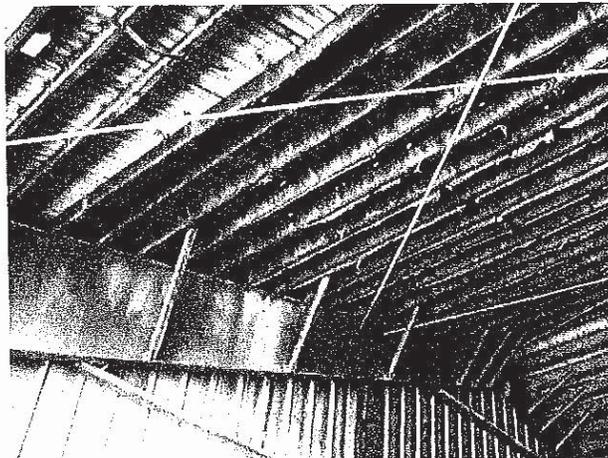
Truckee site – peeling interior paints (salt storage section)
